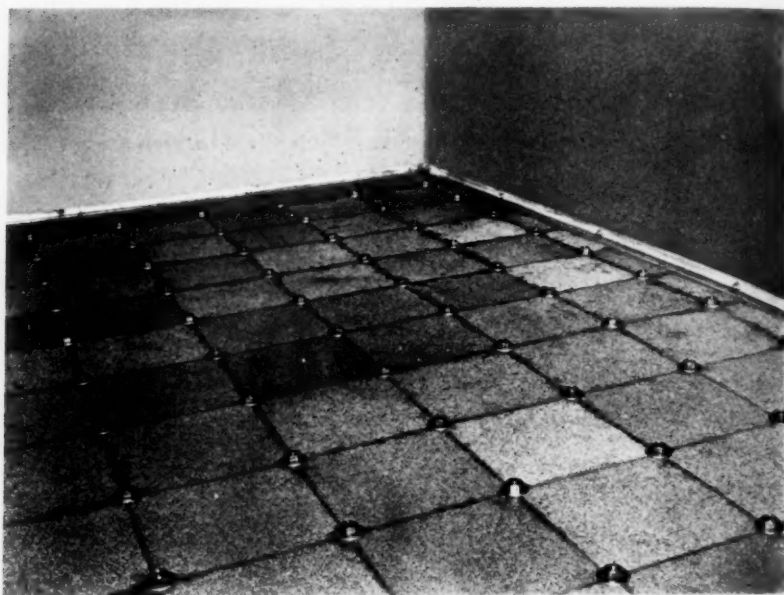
Completed Filter Bottom—Porous Plate Installation
